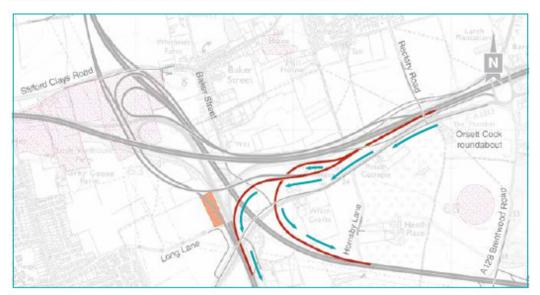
A13 westbound to LTC southbound. Leave the A13 westbound and follow the road, travelling under the connection between the A13 westbound and LTC northbound. Continue on the road, passing under the A1013, and join the LTC southbound.
